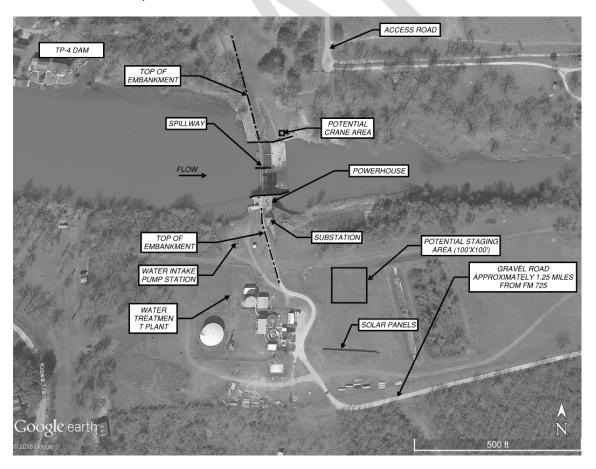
TP-4 (Lake Placid) Spillway Site Plan
